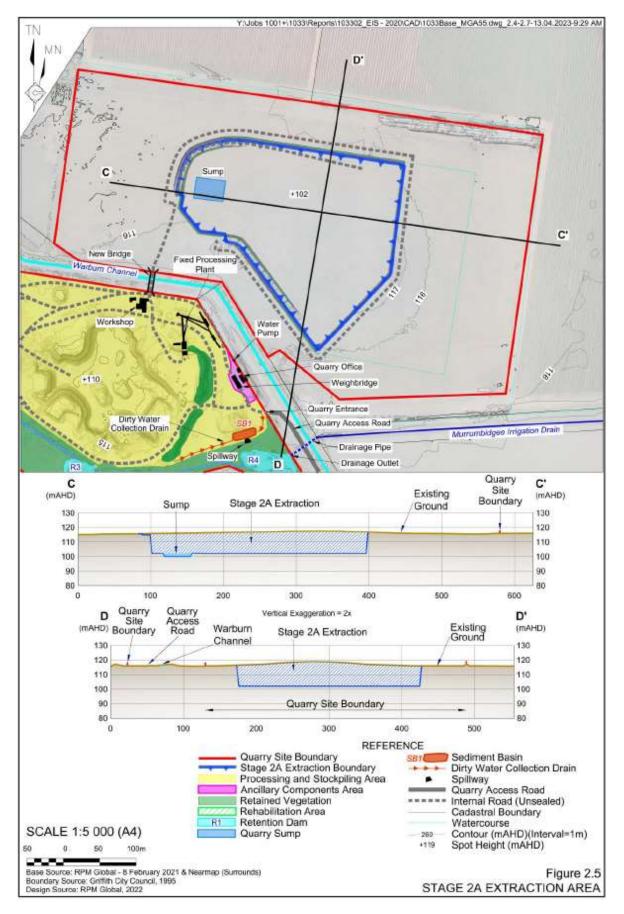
Proposed Extraction Stage 2A and Cross-Sections
